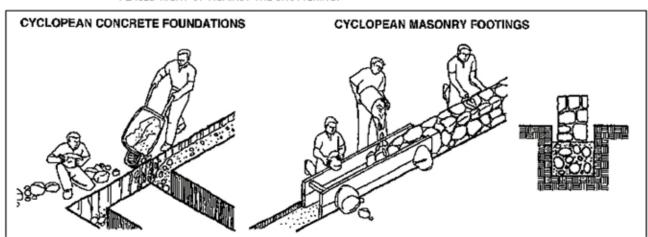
Drawing of cyclopean foundation. Source: COMPRESSED EARTH BLOCKS: MANUAL OF DESIGN AND CONSTRUCTION
